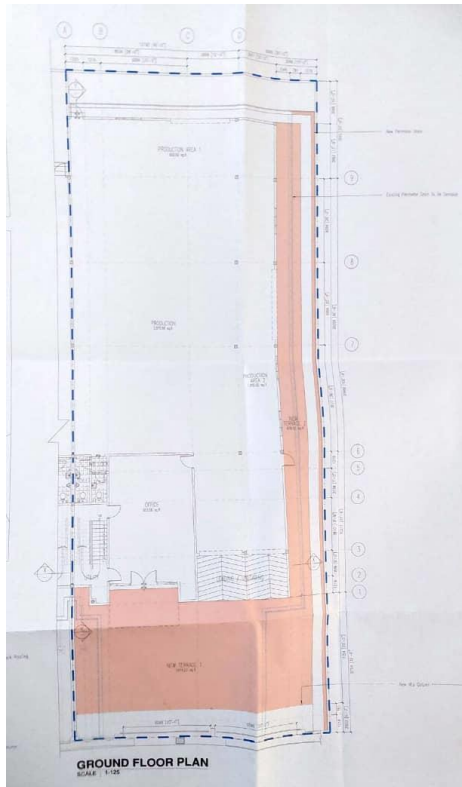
Ground floor plan of Boon Lee Auto SDN. BHD
